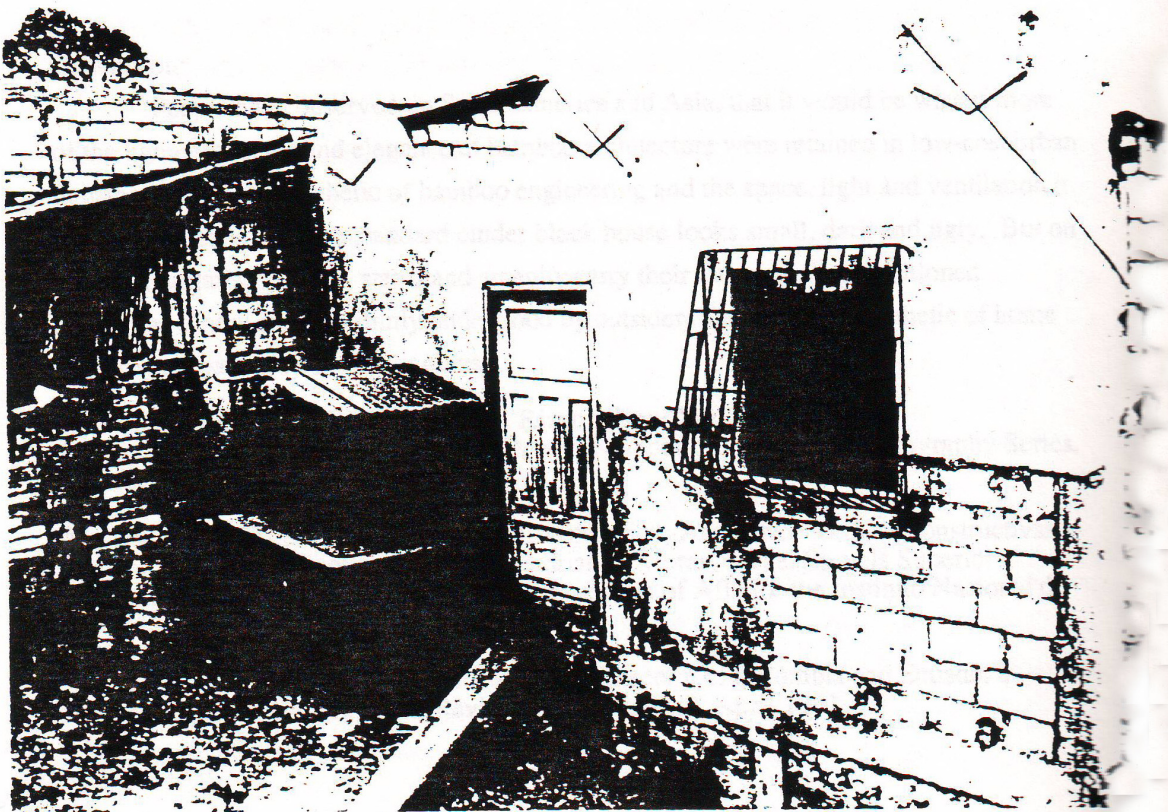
Concrete block house / Casa de bloques de concreto, Guayaquil.
